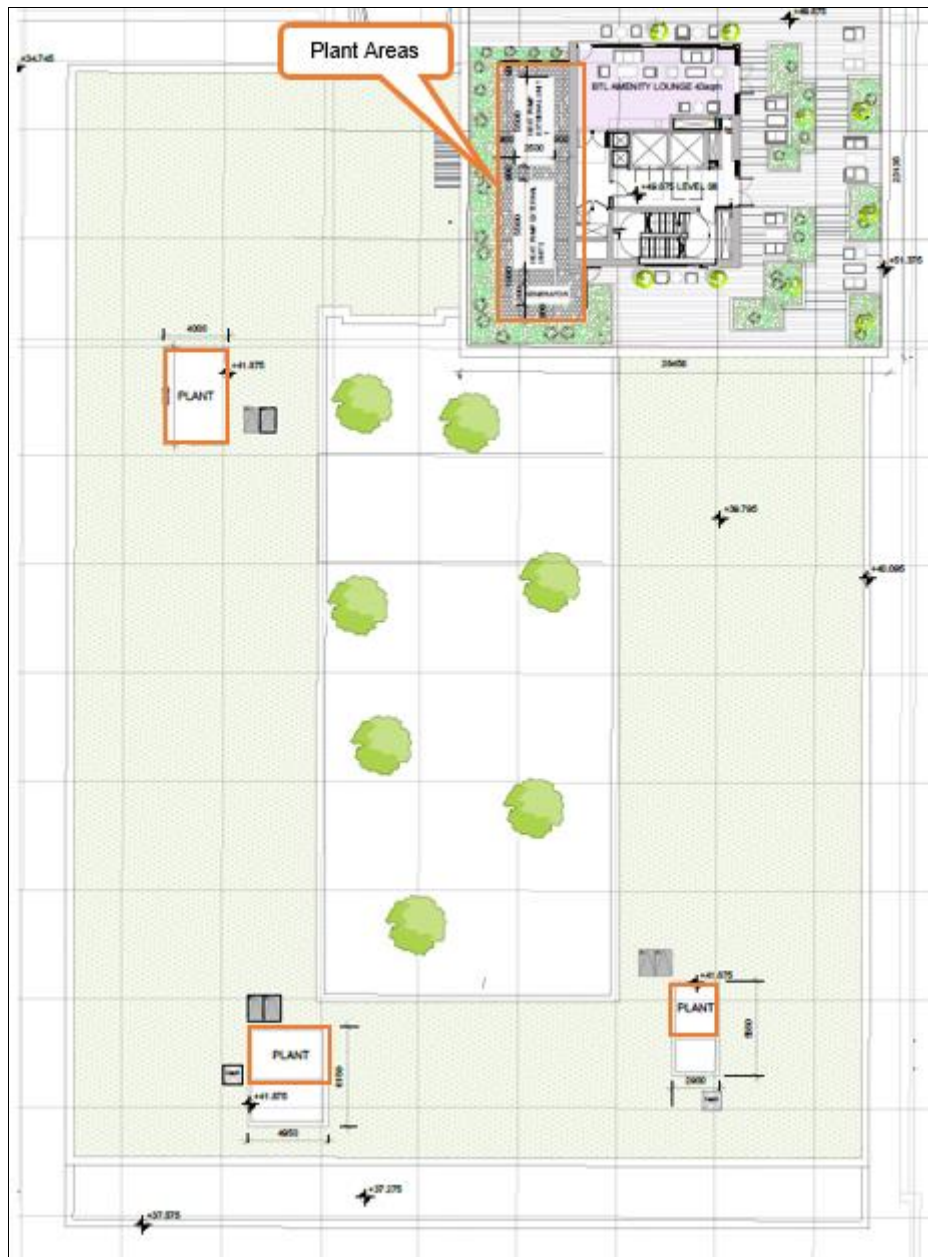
PLANT AREA AT ROOF LEVEL ON BUILDING PW1
